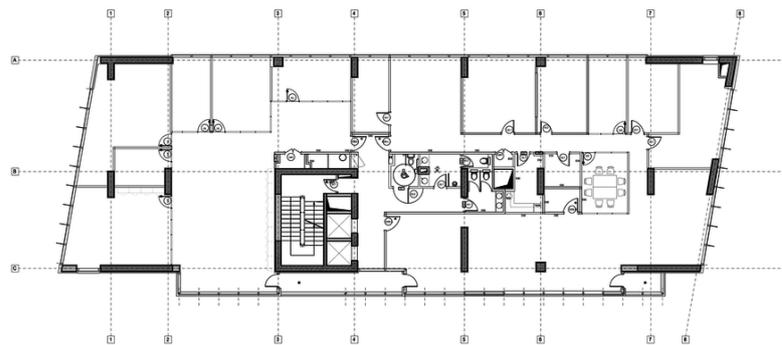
CSDA Sirlului. Current floor plan © Alexandru Calin
